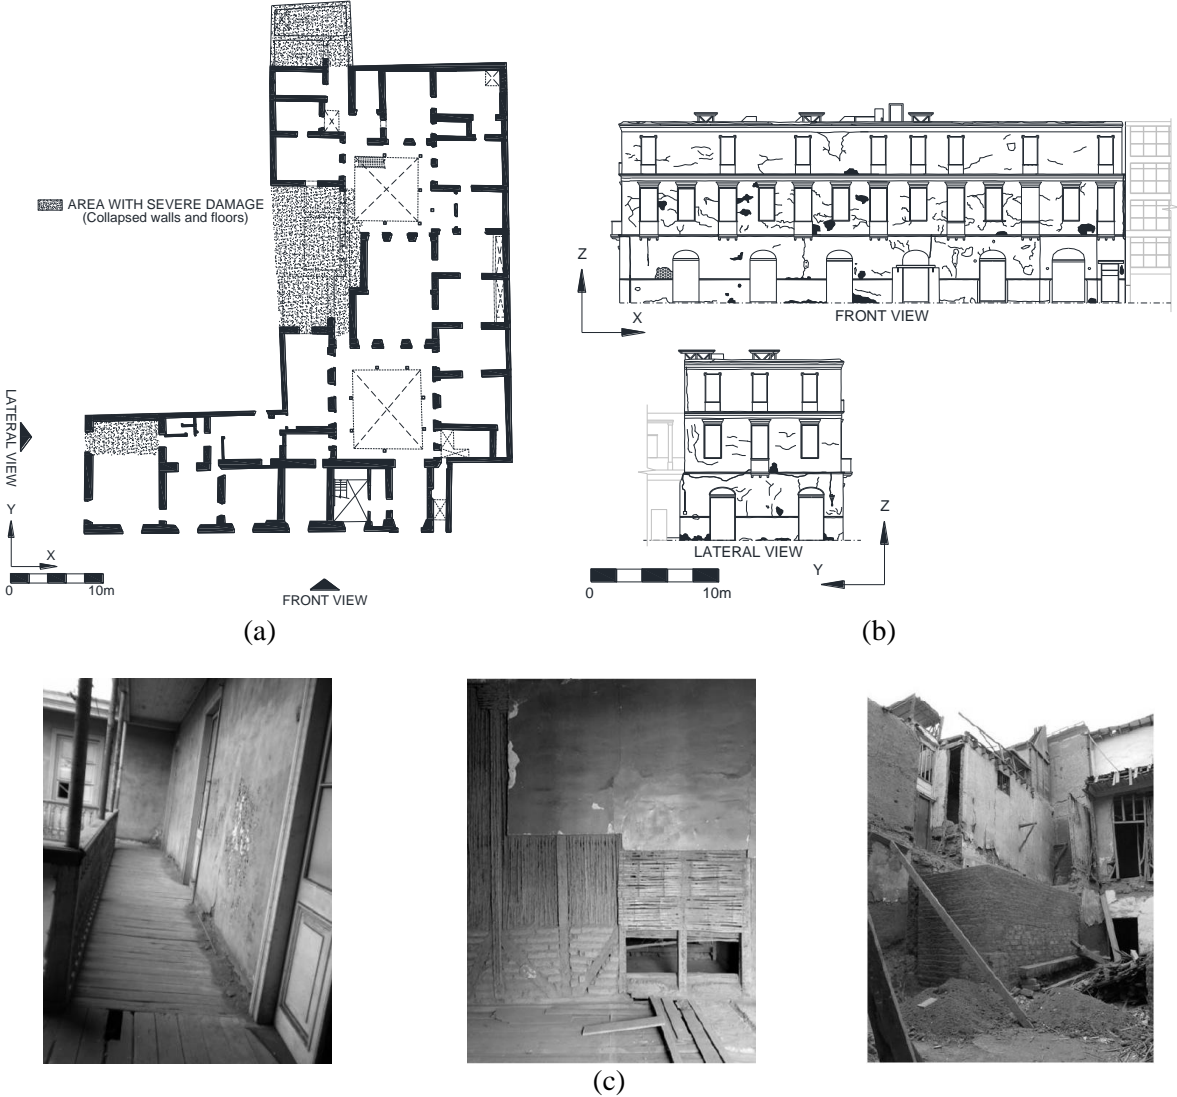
Damage condition of the building: (a) plant view of the first floor; (b) elevation view of the front façades; and (c) pictures of the condition at the interior of the building
